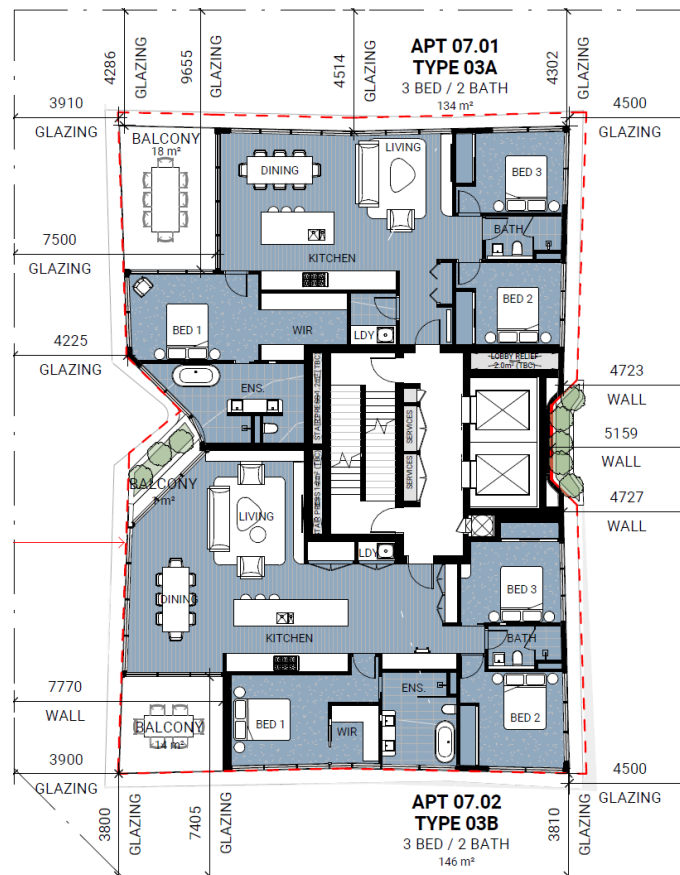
Proposed Level 7-14 Floor Plan (Source: Plus Architecture)
